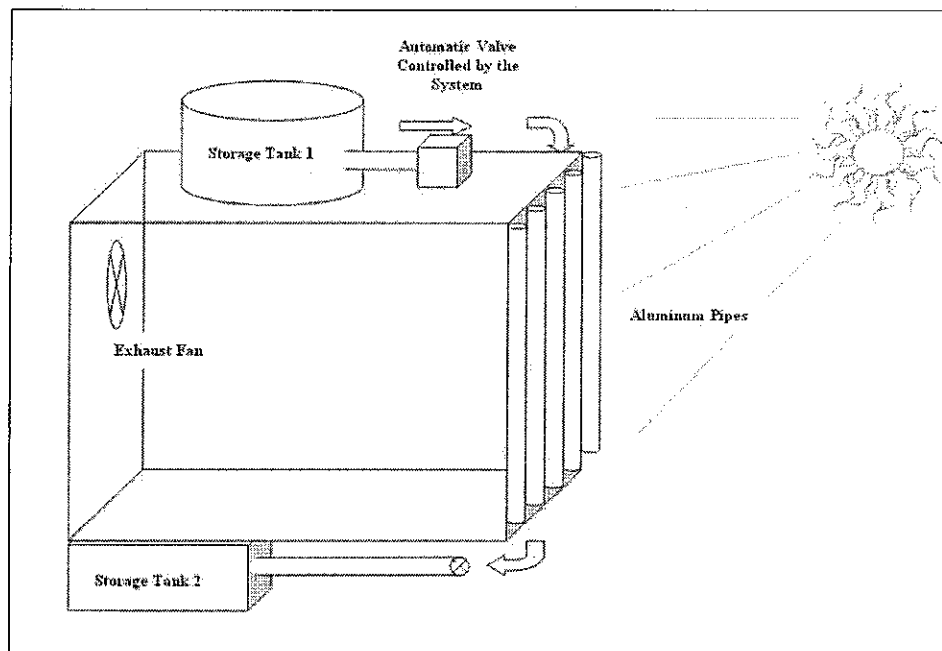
Layout of the system proposed to reduce the heat gain from radiation.
